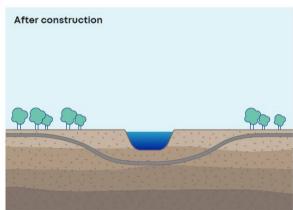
Illustration of trenched pipeline construction through a waterway
